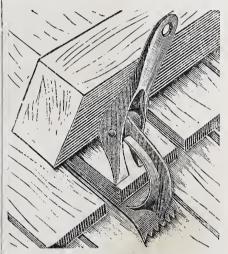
Kennett's Shingling Bracket, About Half Full Size.
